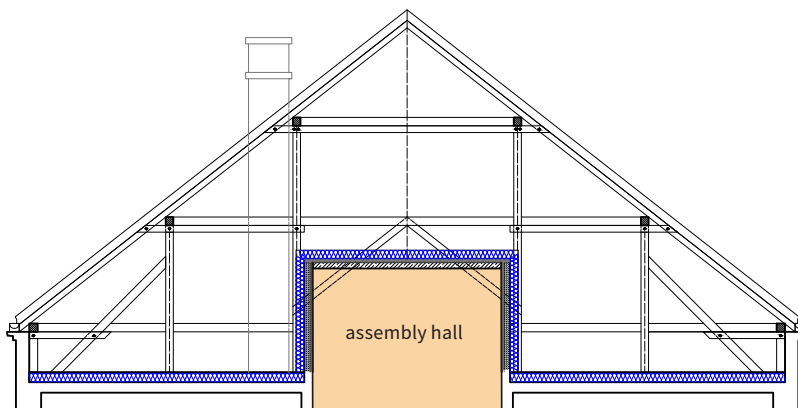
Cross-section of the attic: thermal insulation of the floor and the Assembly Hall's envelope. Drawing: Agata Zapart.
